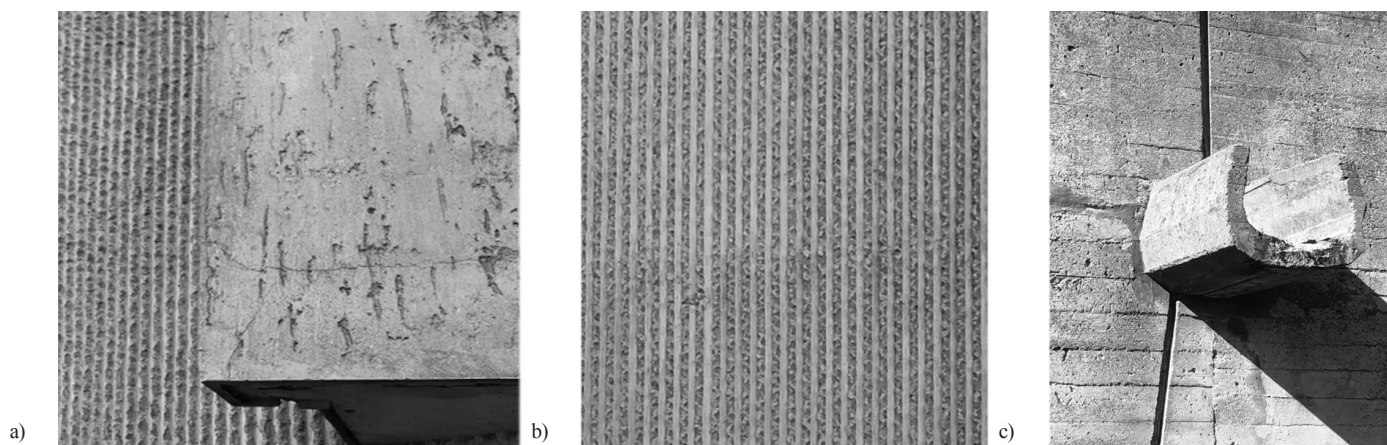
Surface design: a) – “scratch” plaster; b) – “Rudolf style” plaster; c) – *béton brut* (photo collage created by the author).
